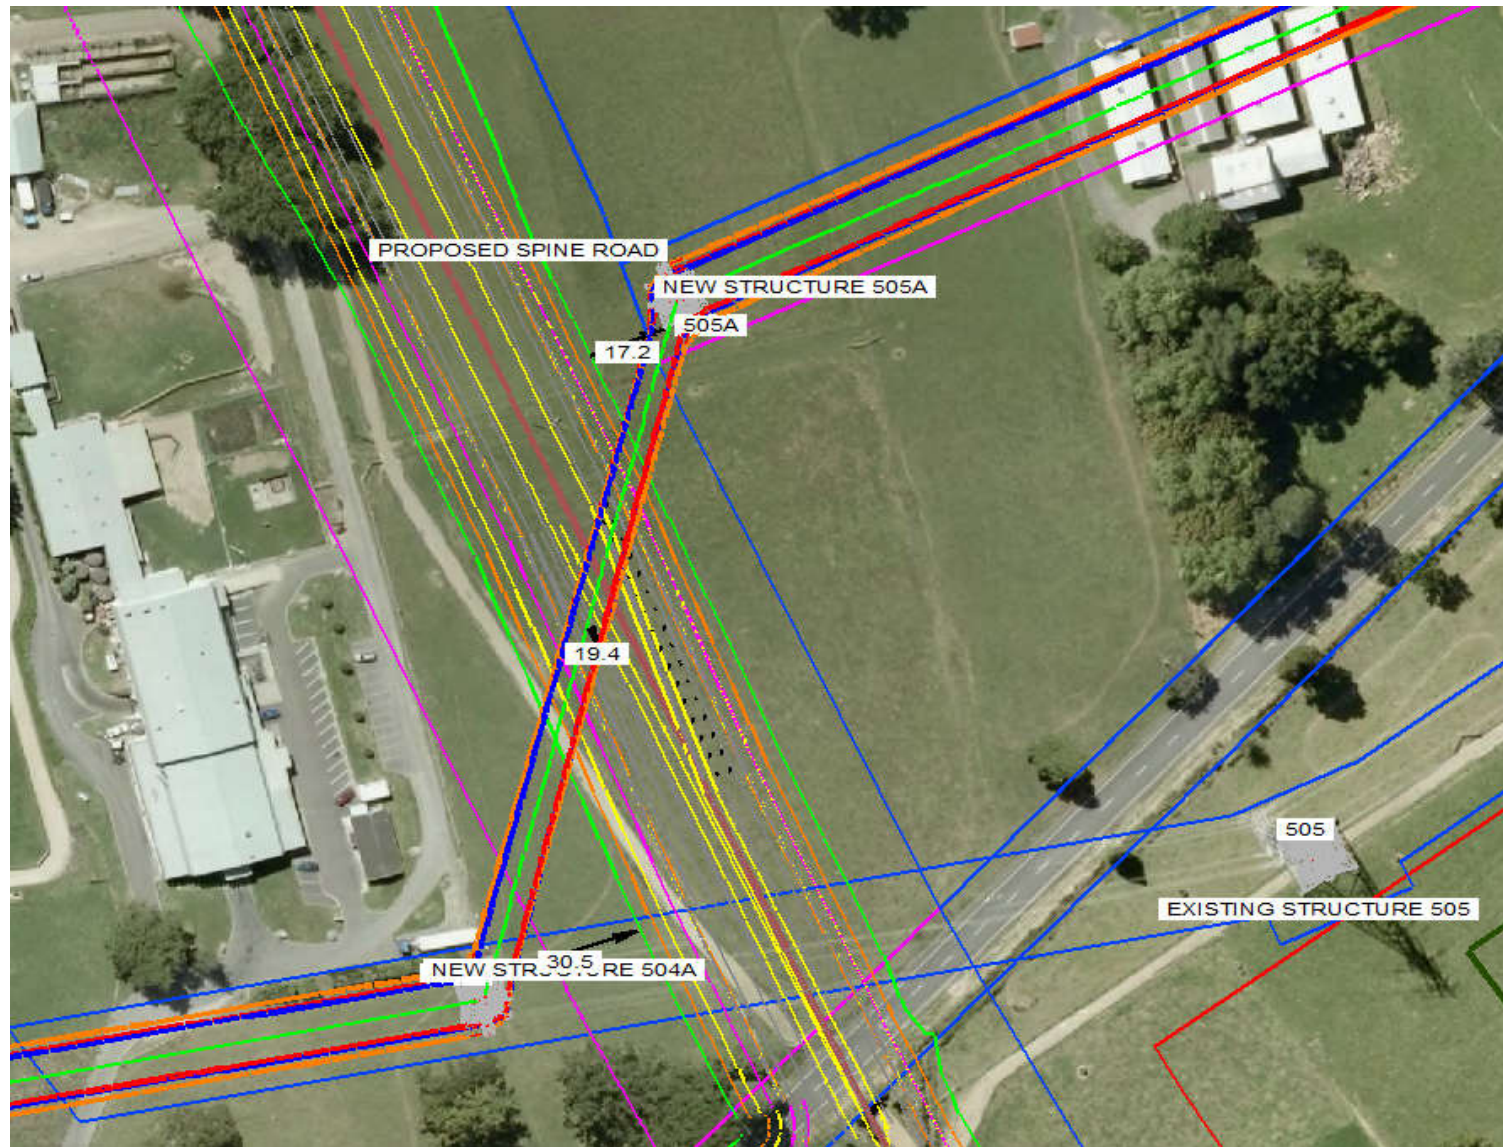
Plan View showing relocated line, boundary parcels and proposed spine road outline
